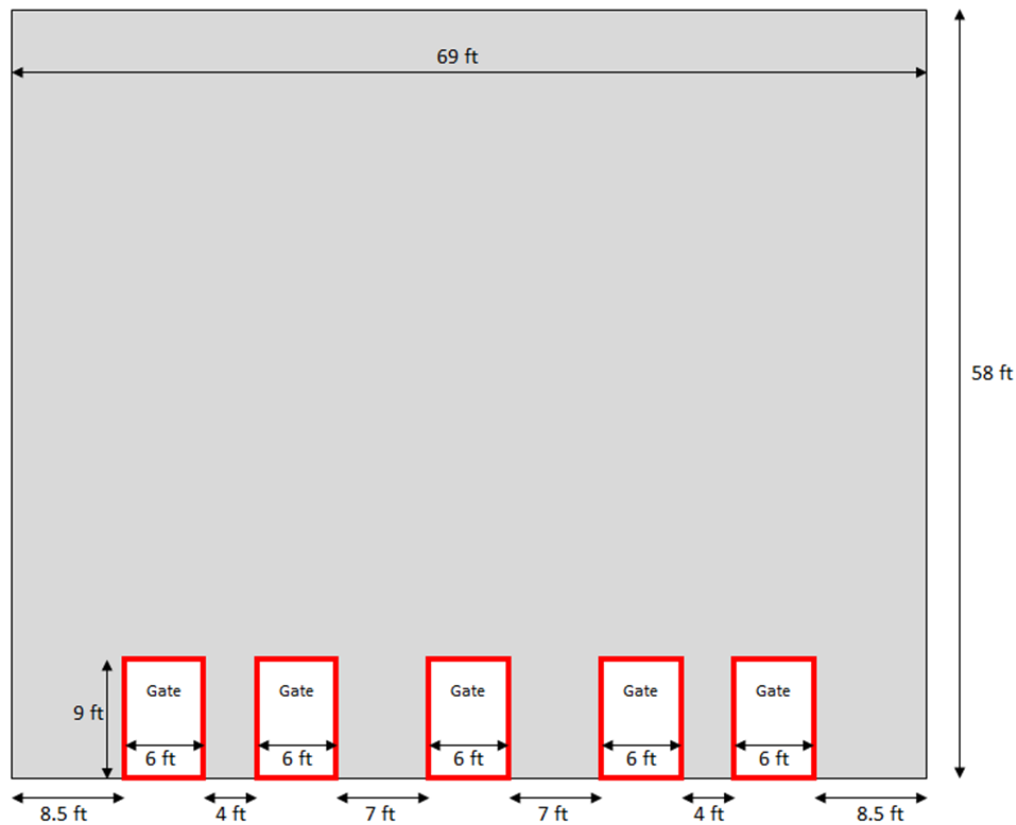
Front view of the intake back wall with five gate opening dimensions.
